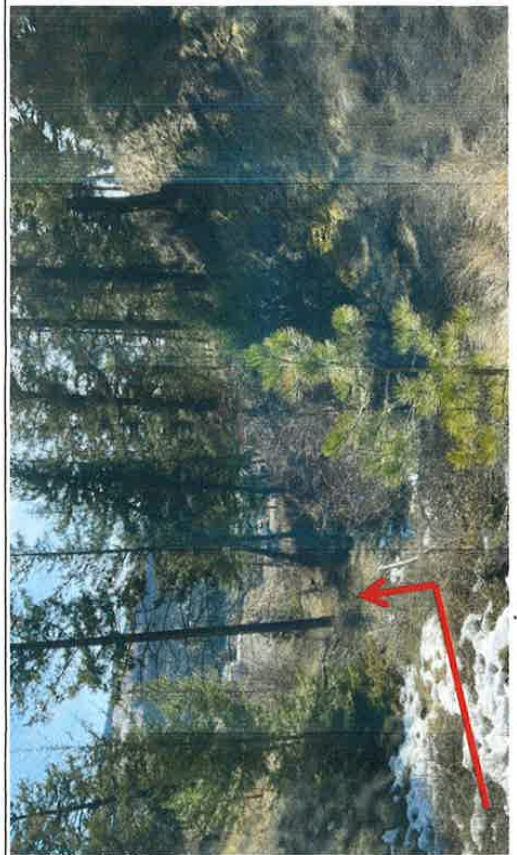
A 400 mm diameter CMP culvert located at the base of the embankment. Debris has infilled approximately 1/3 of the culvert.
